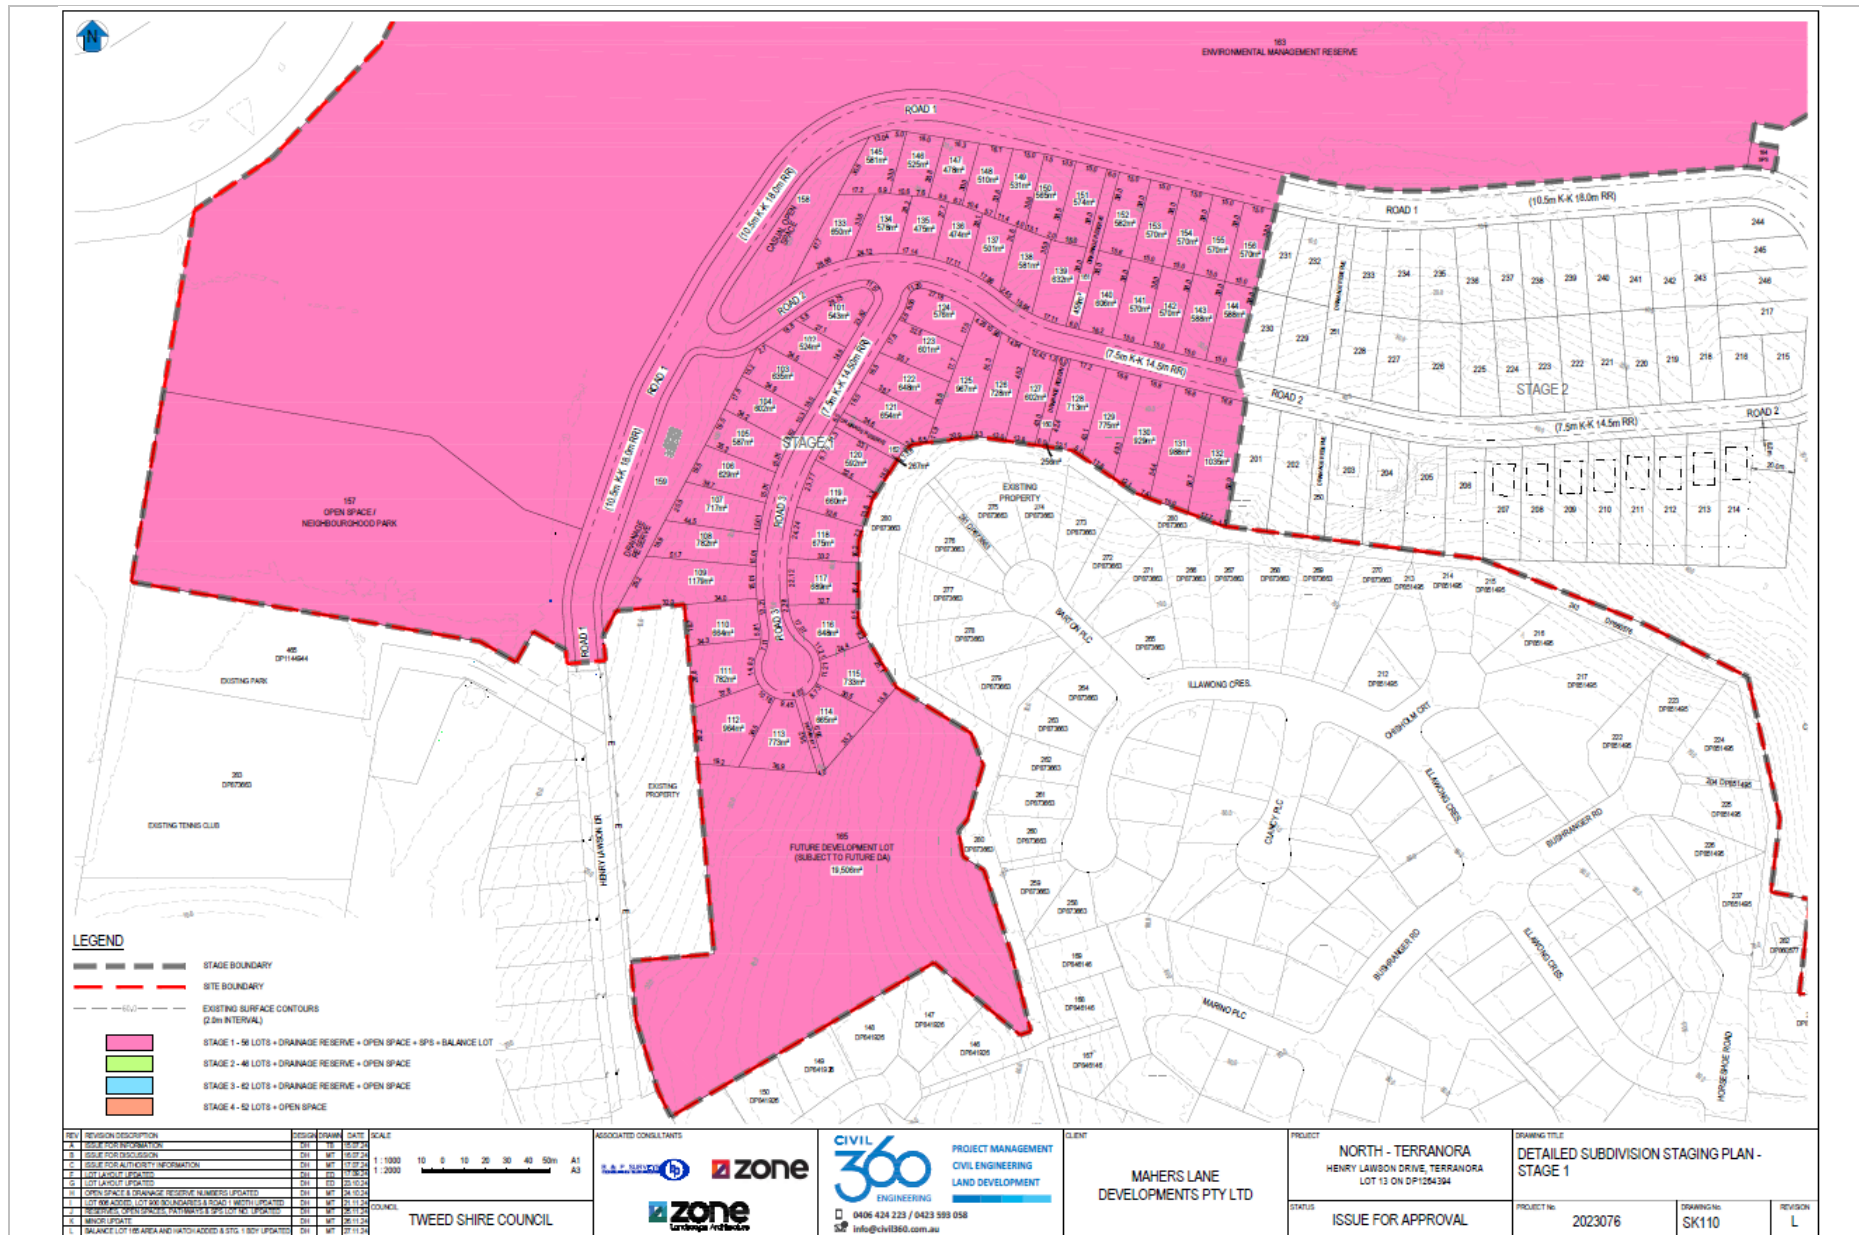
Stage 1 – Proposed development layout (Source: Civil 360 Engineering; Revision L)
